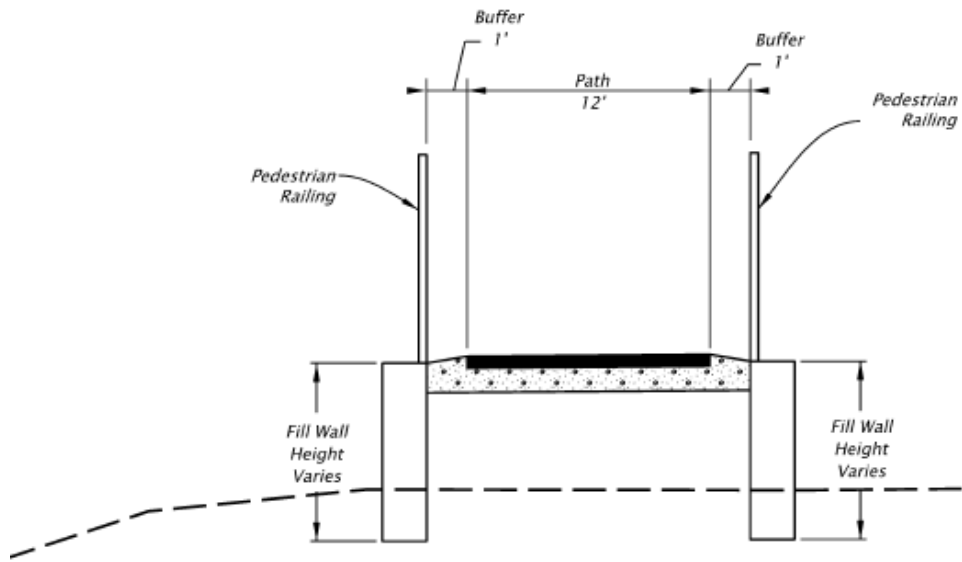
Alternative C1.1 Switchbacks Typical Cross Section
